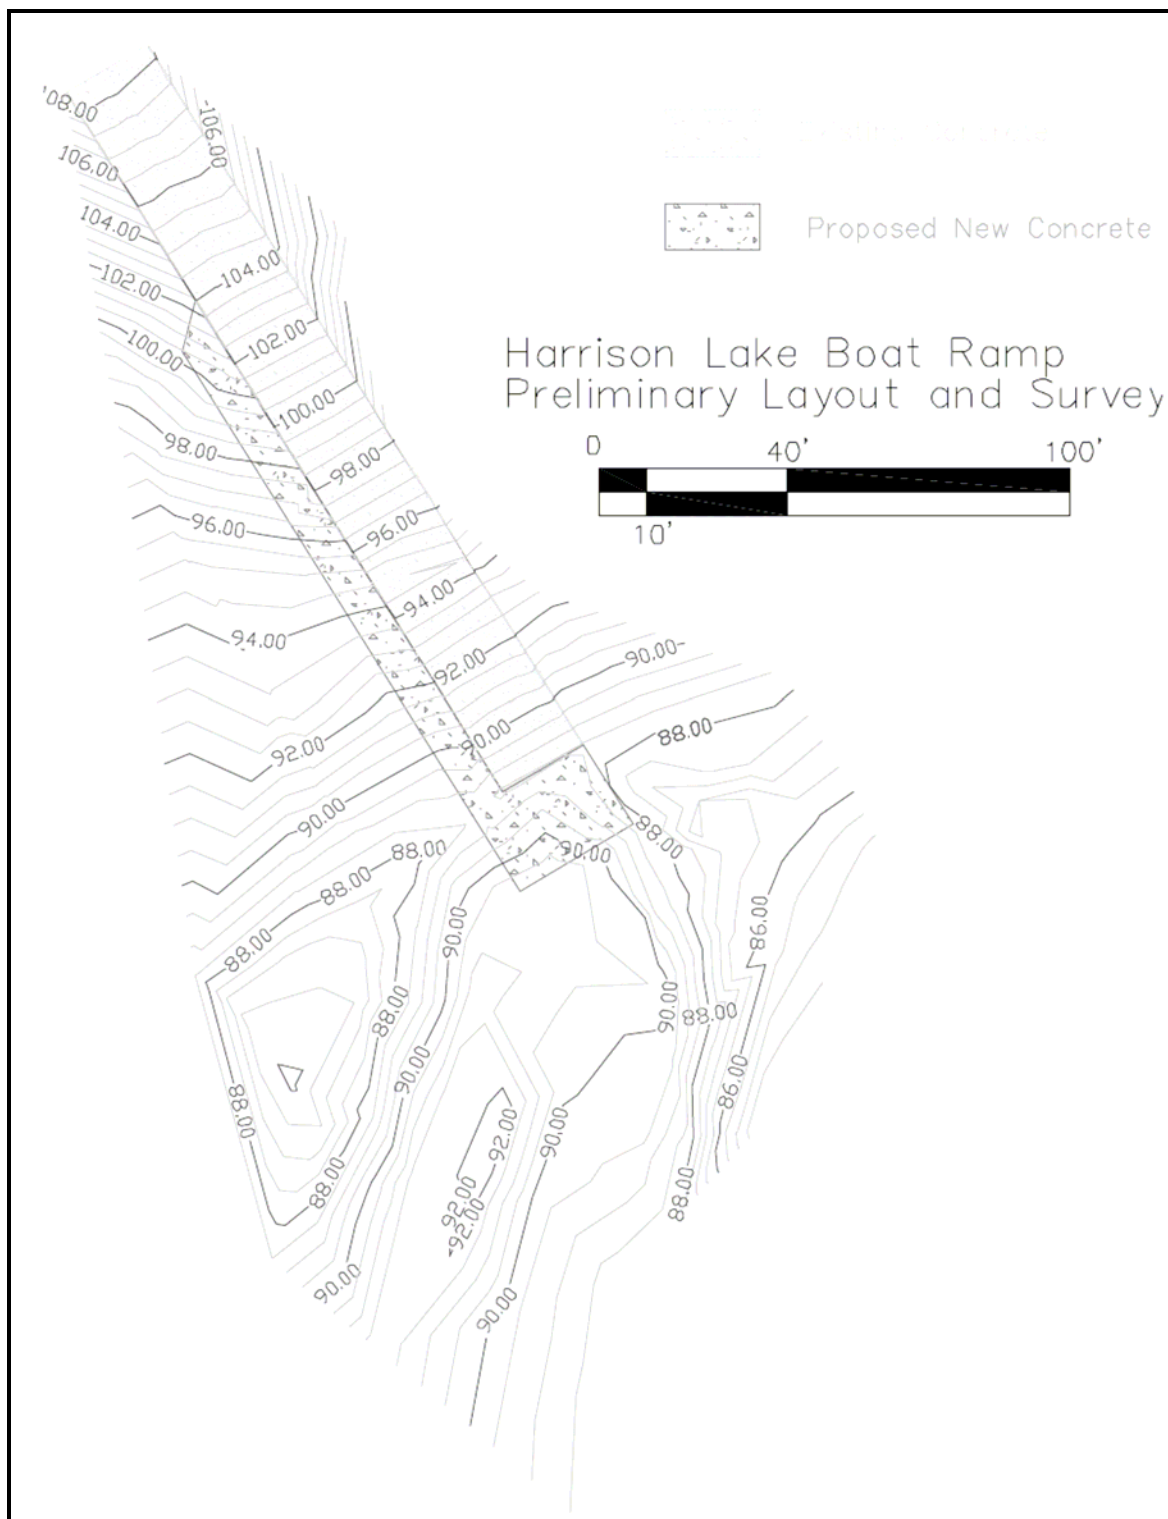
Harrison Lake Boat Ramp extension, preliminary site plan.
